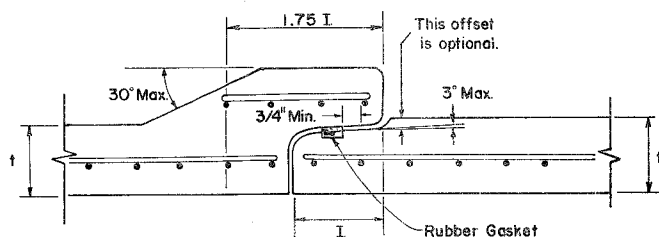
DETAIL OF CONCRETE COLLAR FOR ELLIPTICAL CONCRETE PIPE JOINTS
